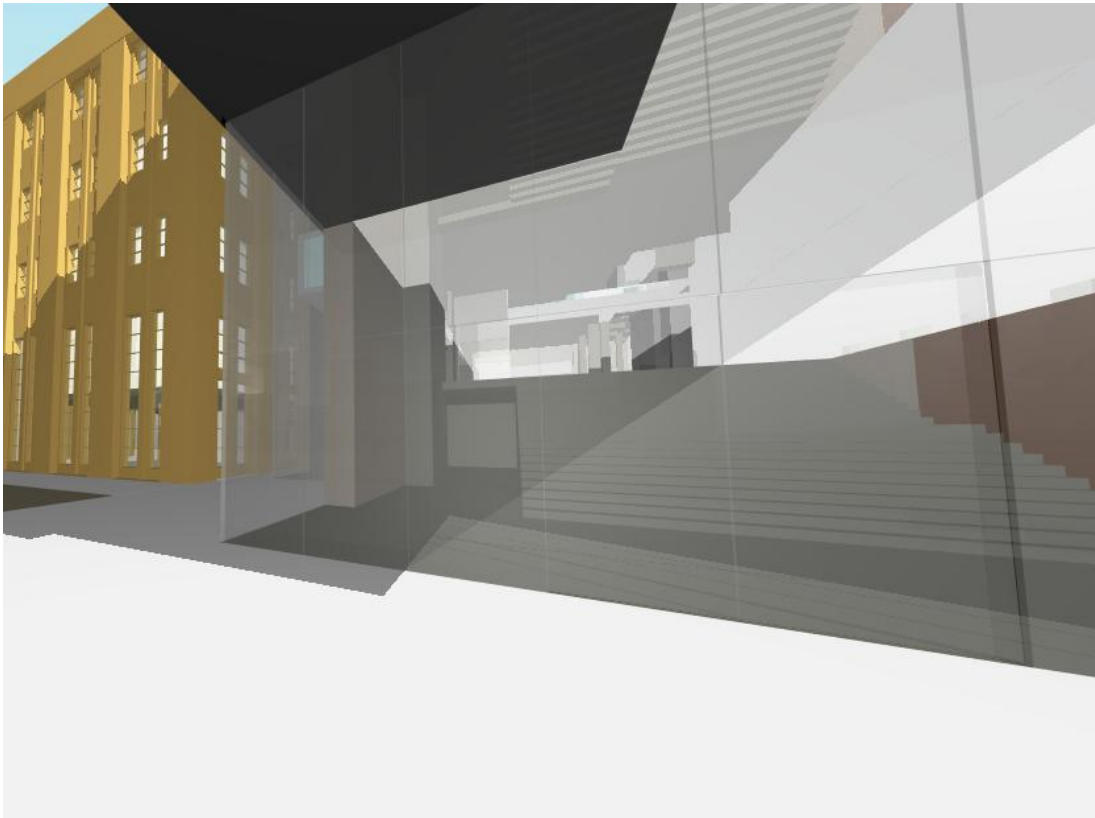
Glass lift and connection to existing building, viewed from Circular Quay
